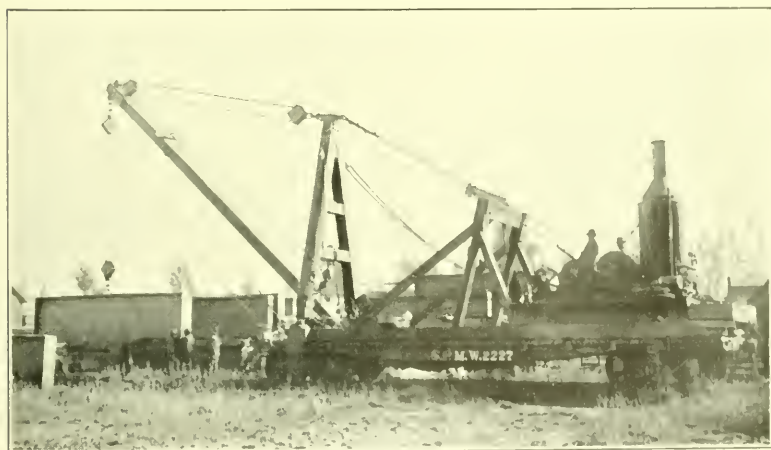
DERRICK CAR, HANDLING BRIDGE MATERIAL.
